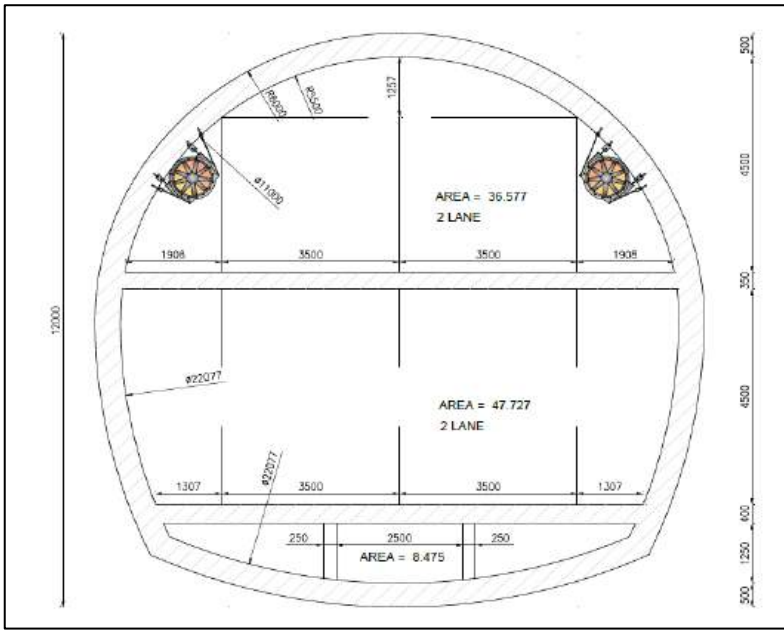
4-Lane Horse Shoe Tunnel Typical Cross Section
